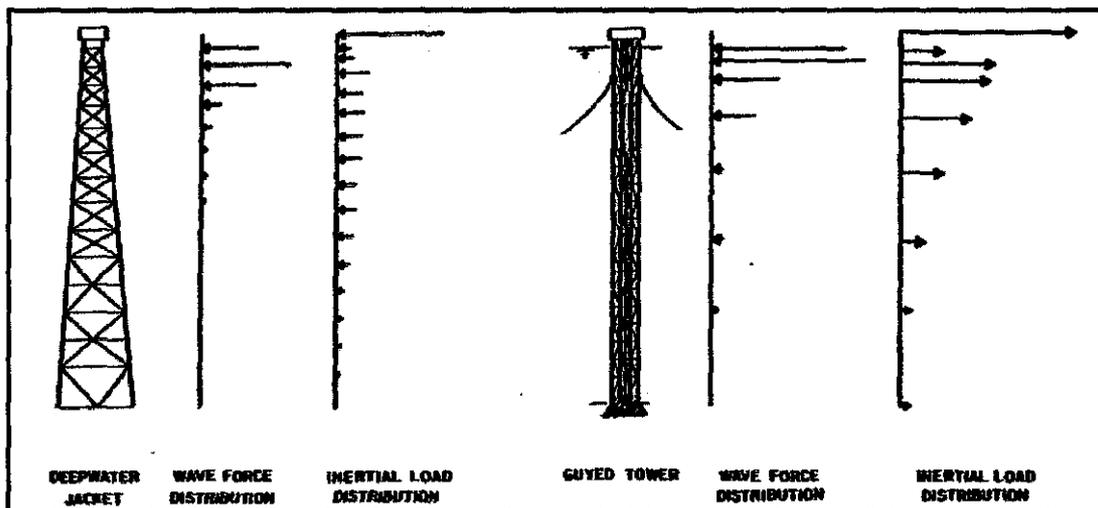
Deepwater jacket and guyed tower, wave force and inertial load distribution
